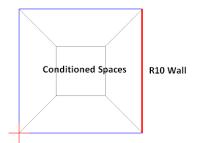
Floor Area and Floor Perimeter for Conditioned Spaces connected to Unconditioned Spaces
